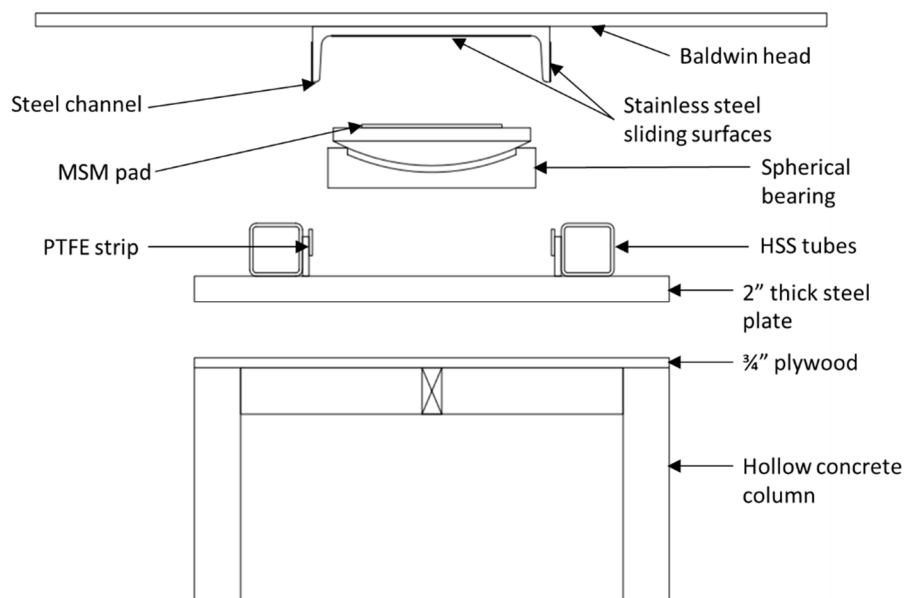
Spherical Bearing with Low Friction Sliding Surface
